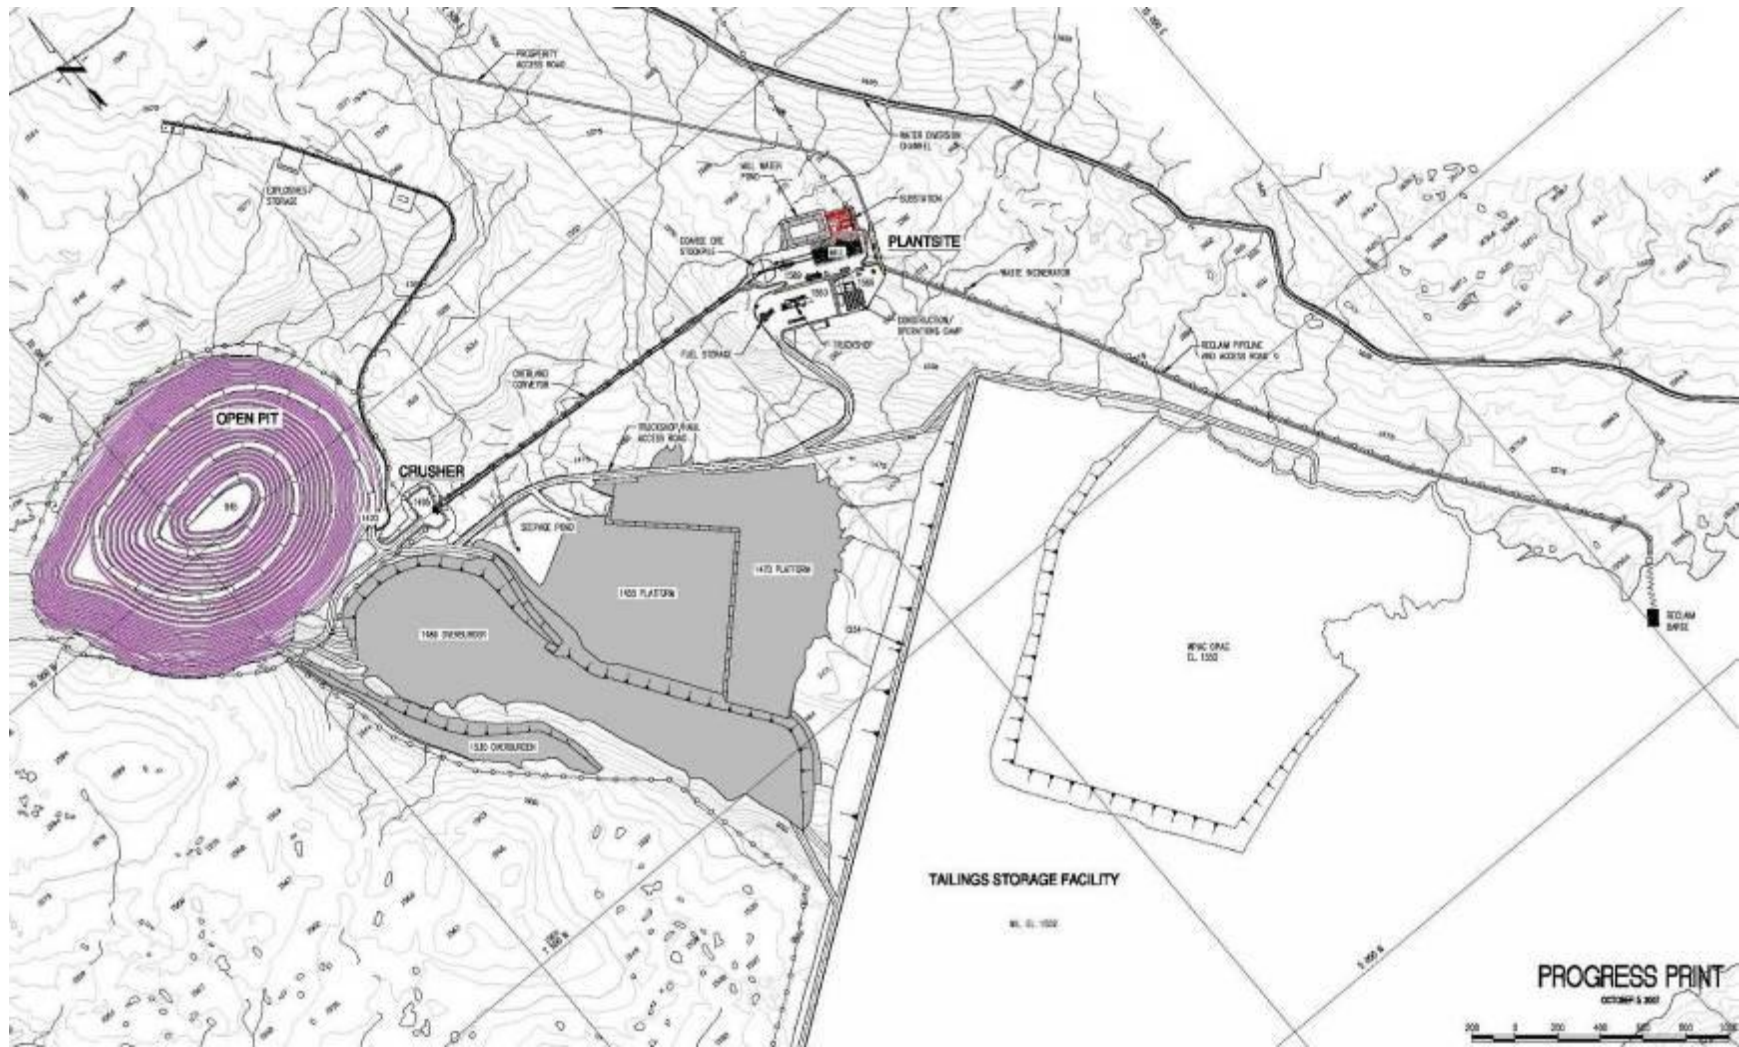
Pit and Stockpiles Plan–End of Year 20
